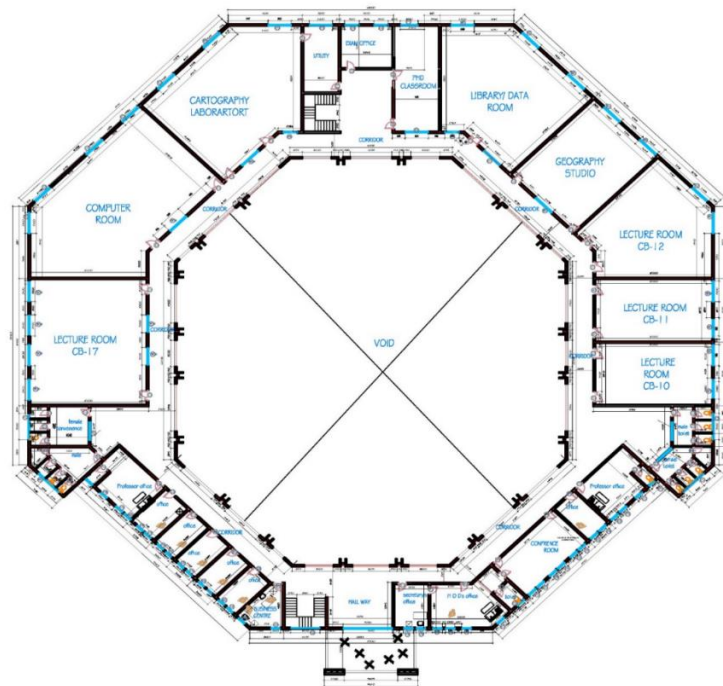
Architectural Floor Plan of Geography Department (Block C)
